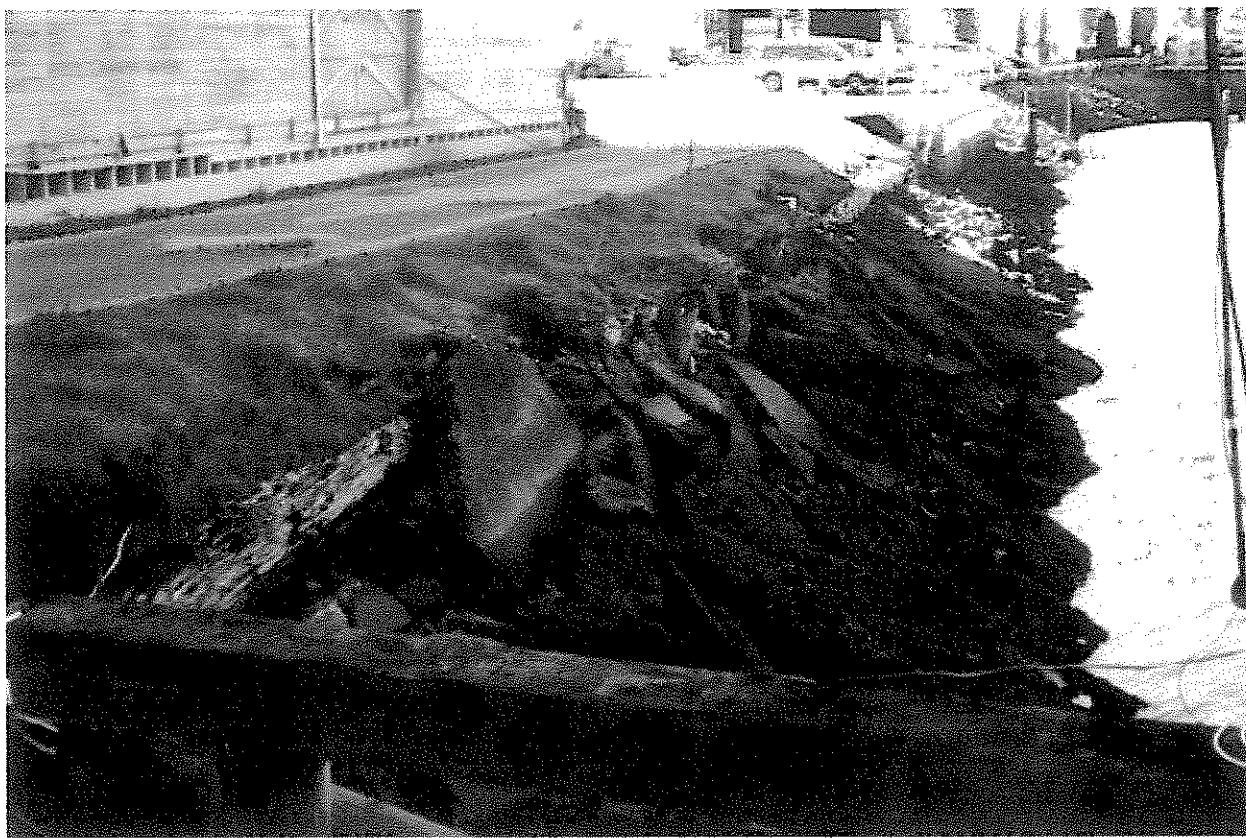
Concrete slab riprap at south portion of Project area from pumphouse.
